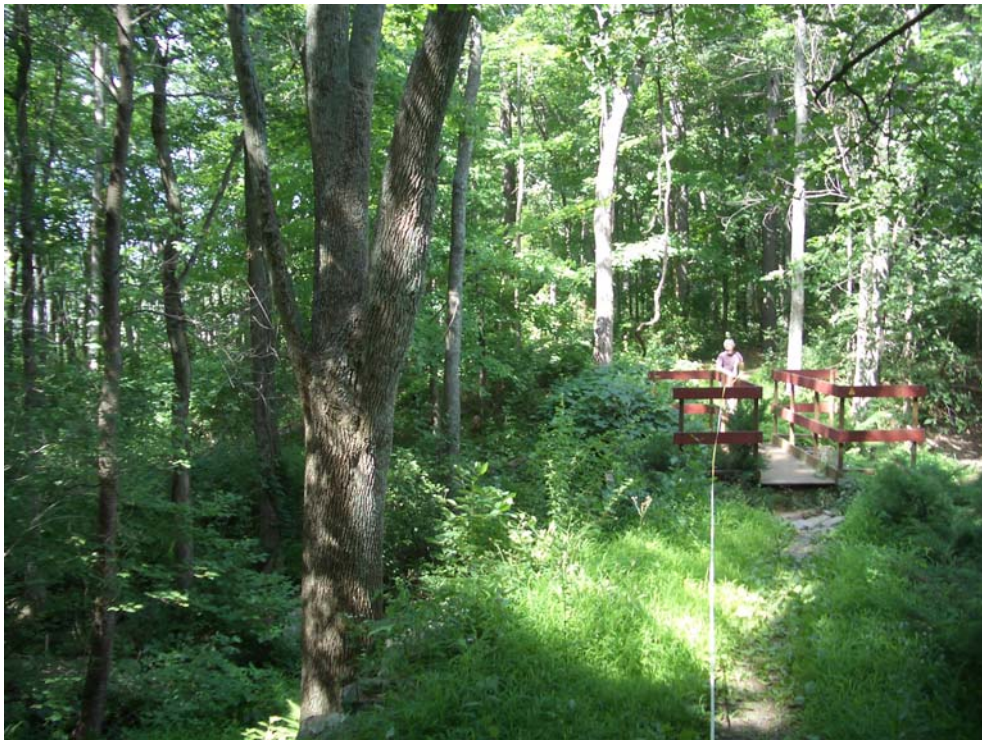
Taken from left abutment (east facing west) of dam and downstream.
